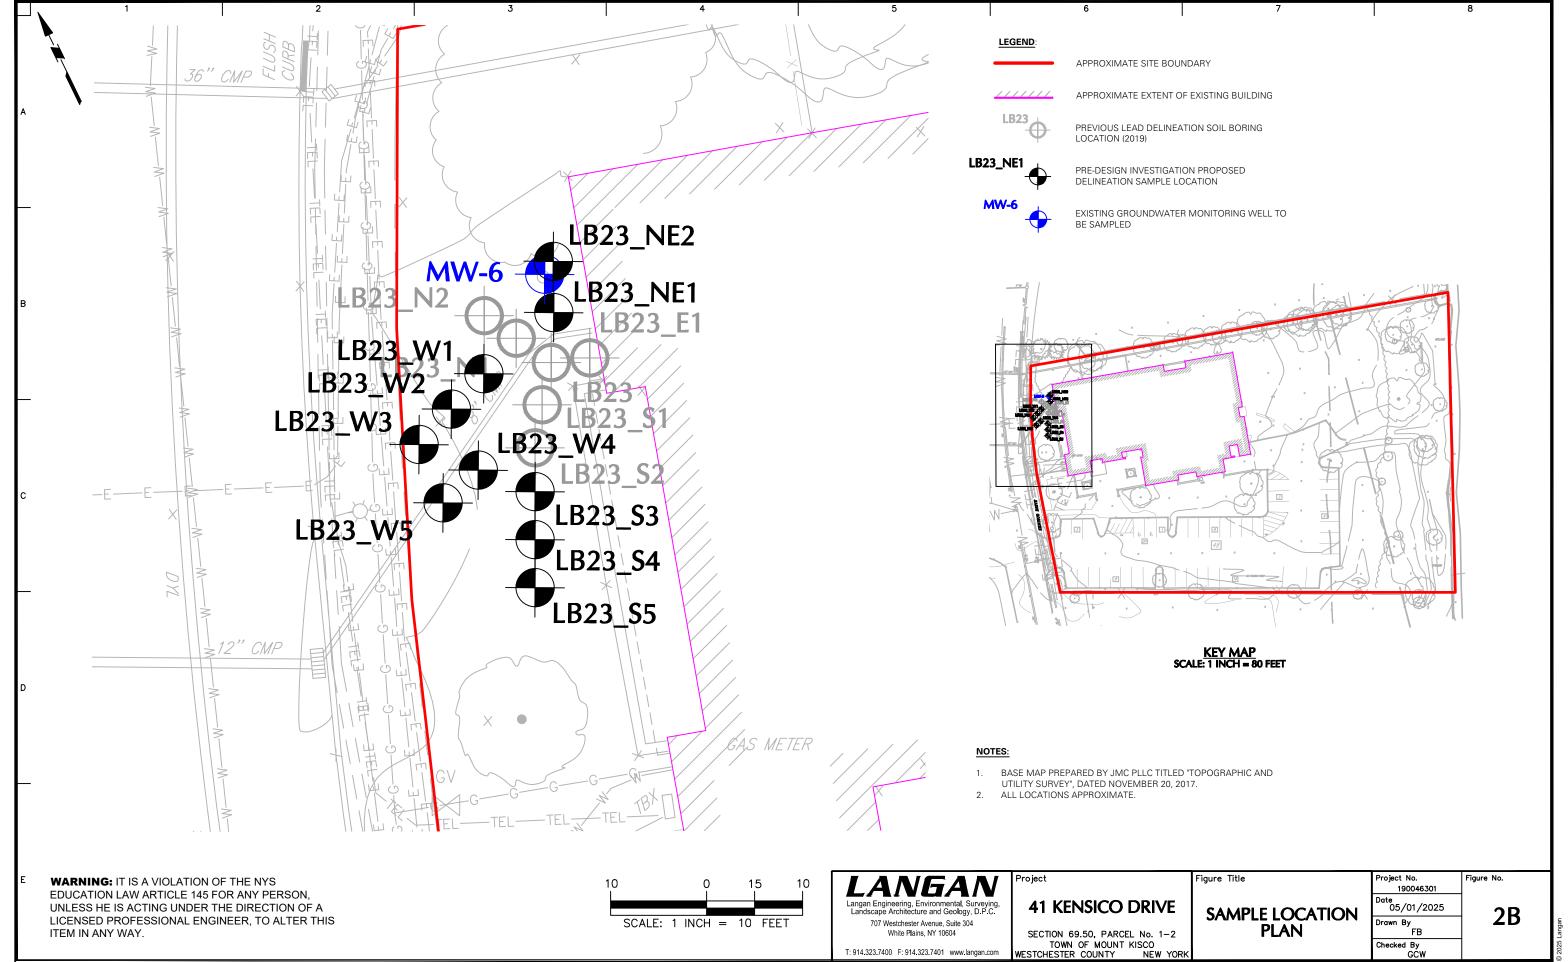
A – Test Pit Location Plan Figure 2B – Sample Location Plan
